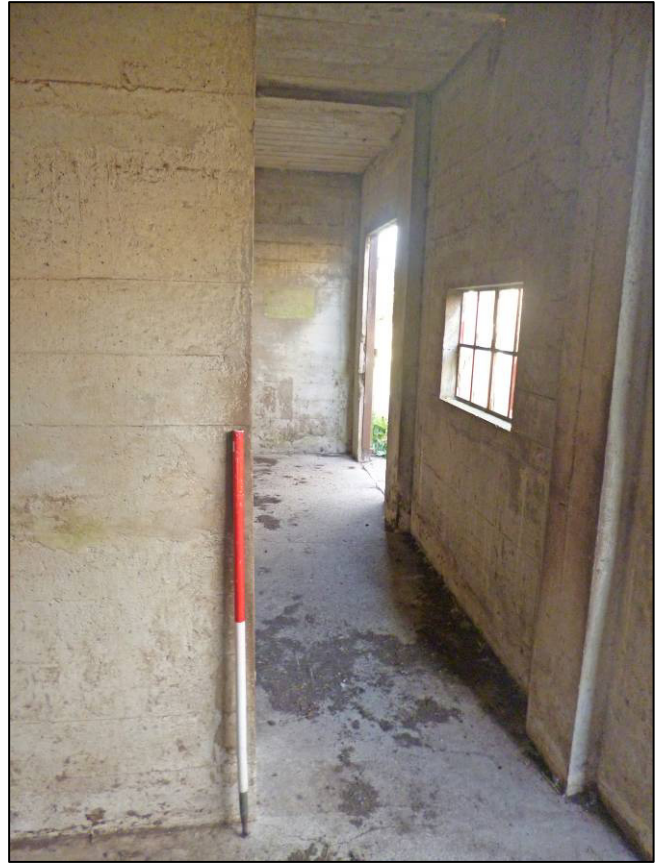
Structure H (magazine), openings between internal bays, looking SW (photo 2/221).
